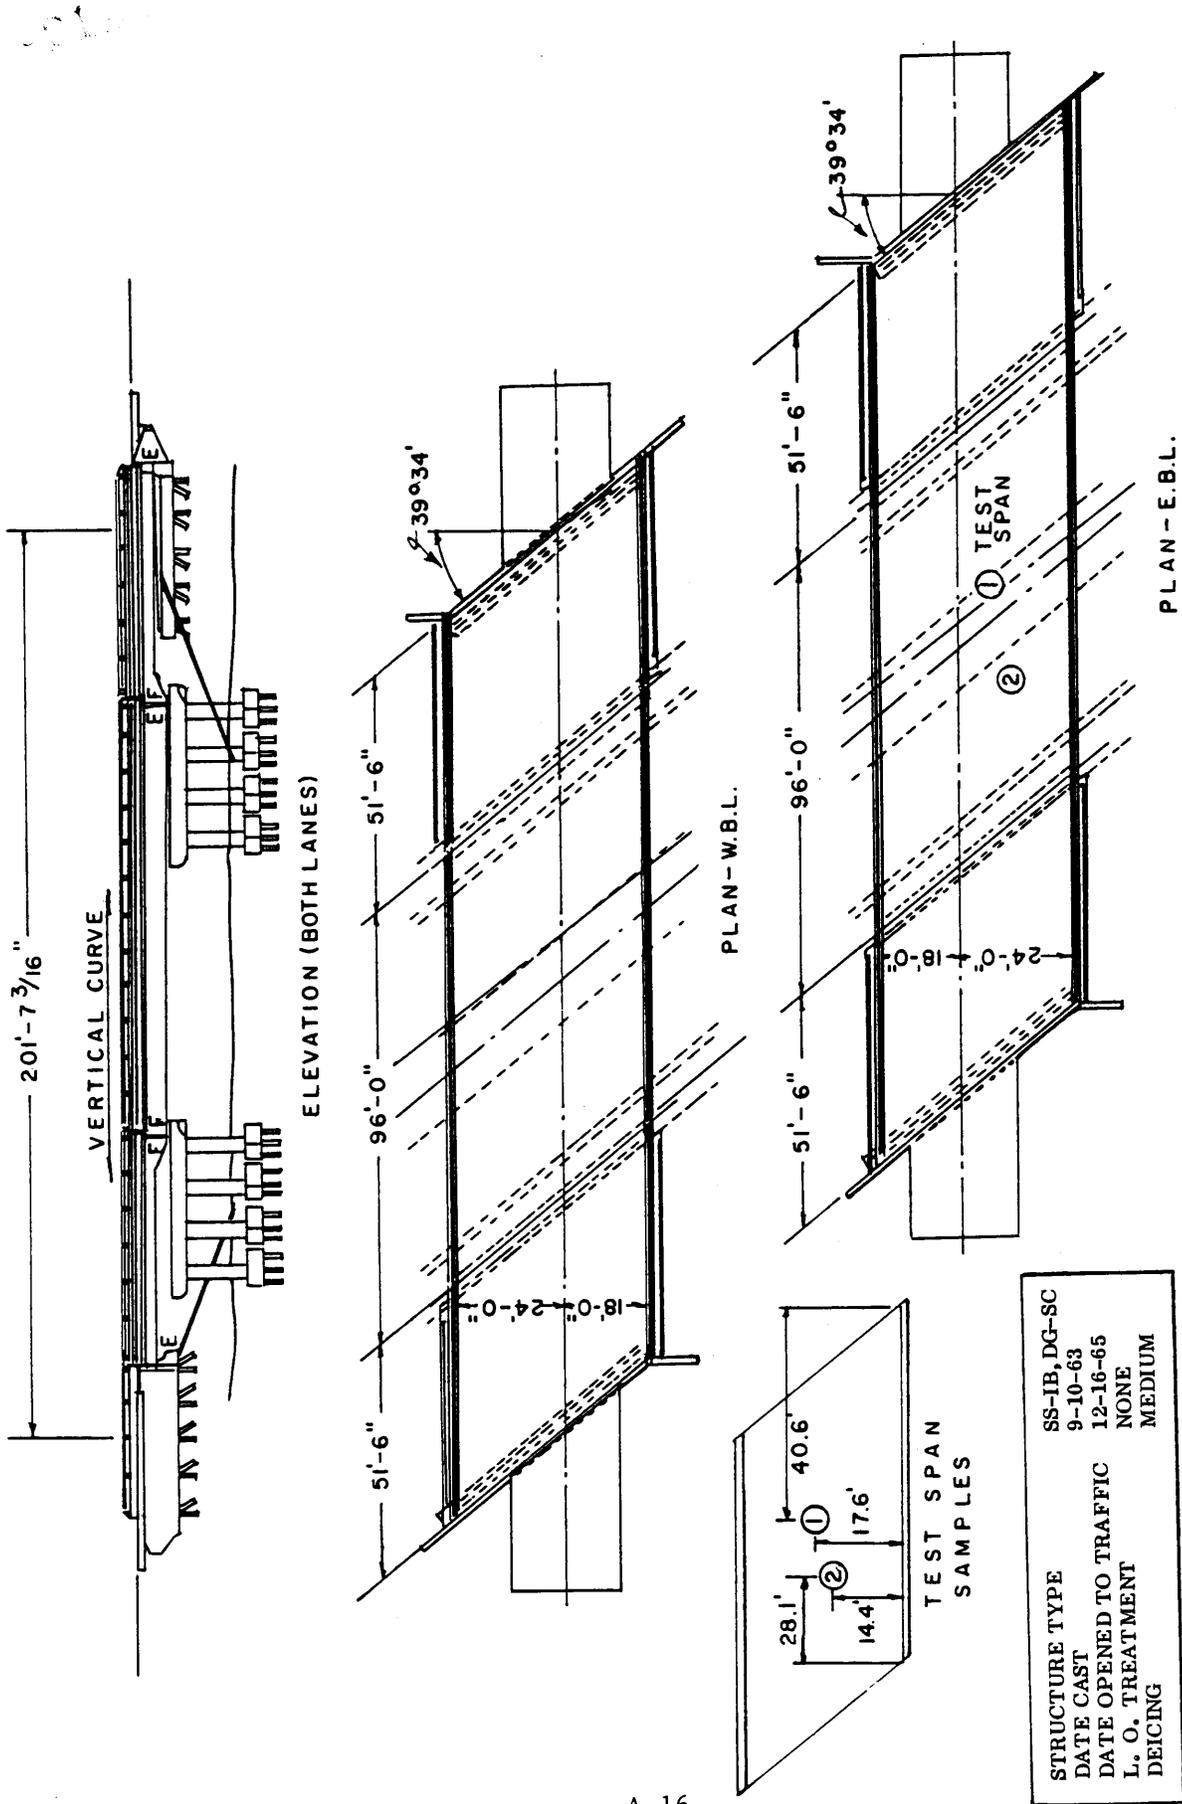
Plan for bridge #15; also shown are the locations of test samples.
